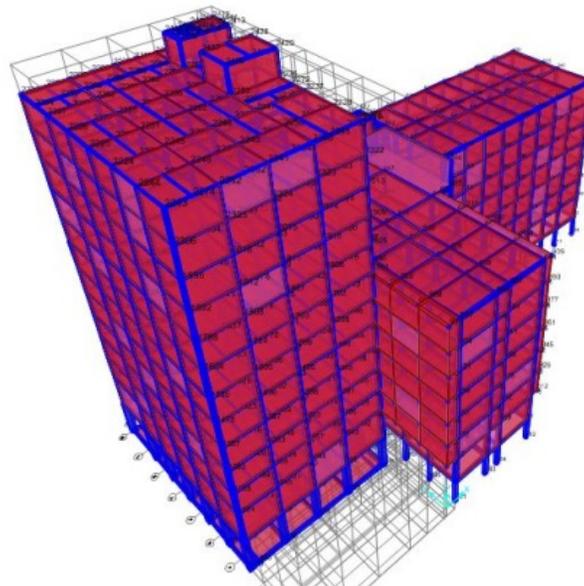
3D Model of Adjacent buildings connecting with damper
